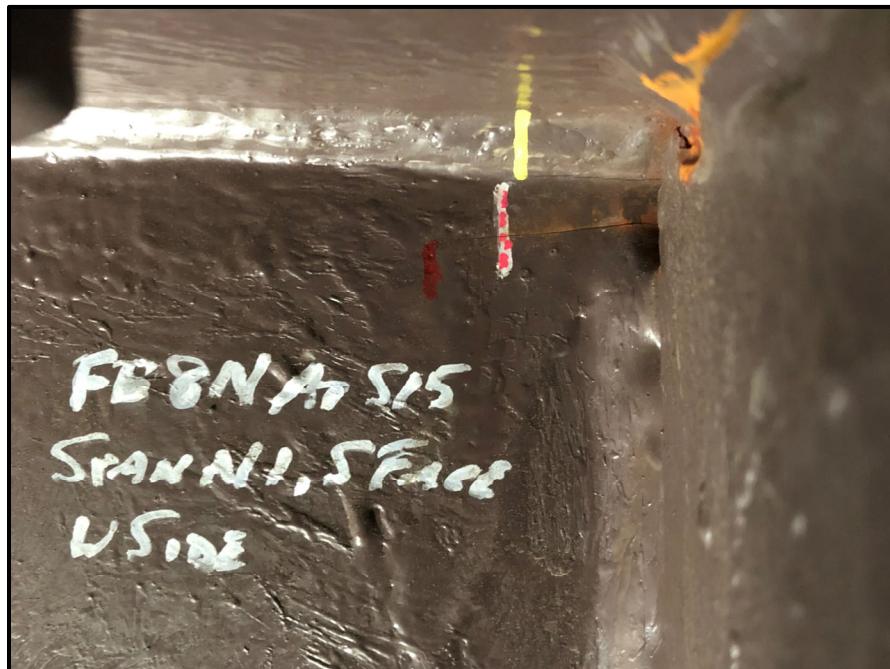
Span N1, Floorbeam 8N at Stringer 15S - Close-up view of the west projection of the 2-5/8" L (total) paint crack along the lower toe of the web-to-upper flange weld on the south face, looking north. Note the cracked web at the upper end of the web stiffener-to-web weld which extends horizontally to the west for 1-11/16" (continuation of the vertical crack depicted in Photo 13).
